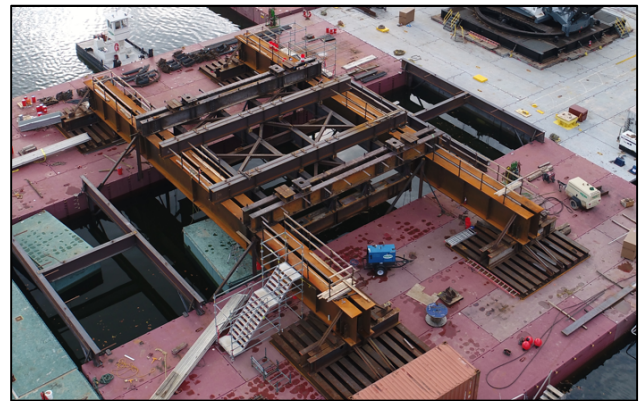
Fully assembled barge lowering platform prior to strand jack installation
